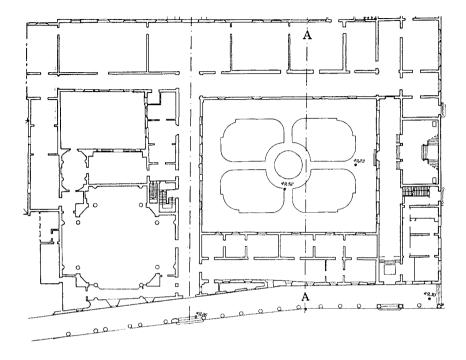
Ground Floor Plan of National Gallery and Fine Arts Academy
